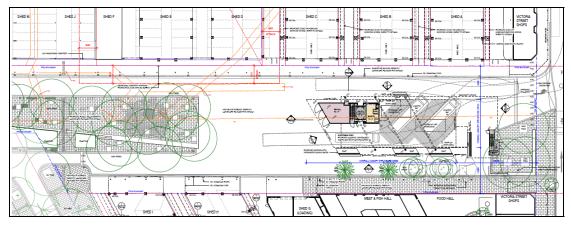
Proposed plan for Queen Street (section of Queen Street within the Site)
